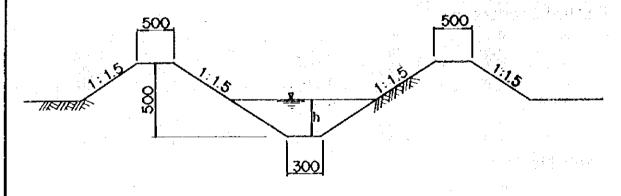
FIG. VII-I TYPICAL CROSS SECTION OF IRRIGATION CANAL
